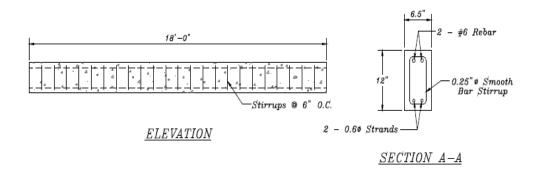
Elevation and cross-section of the tested beams (Ruiz et al. 2006).
